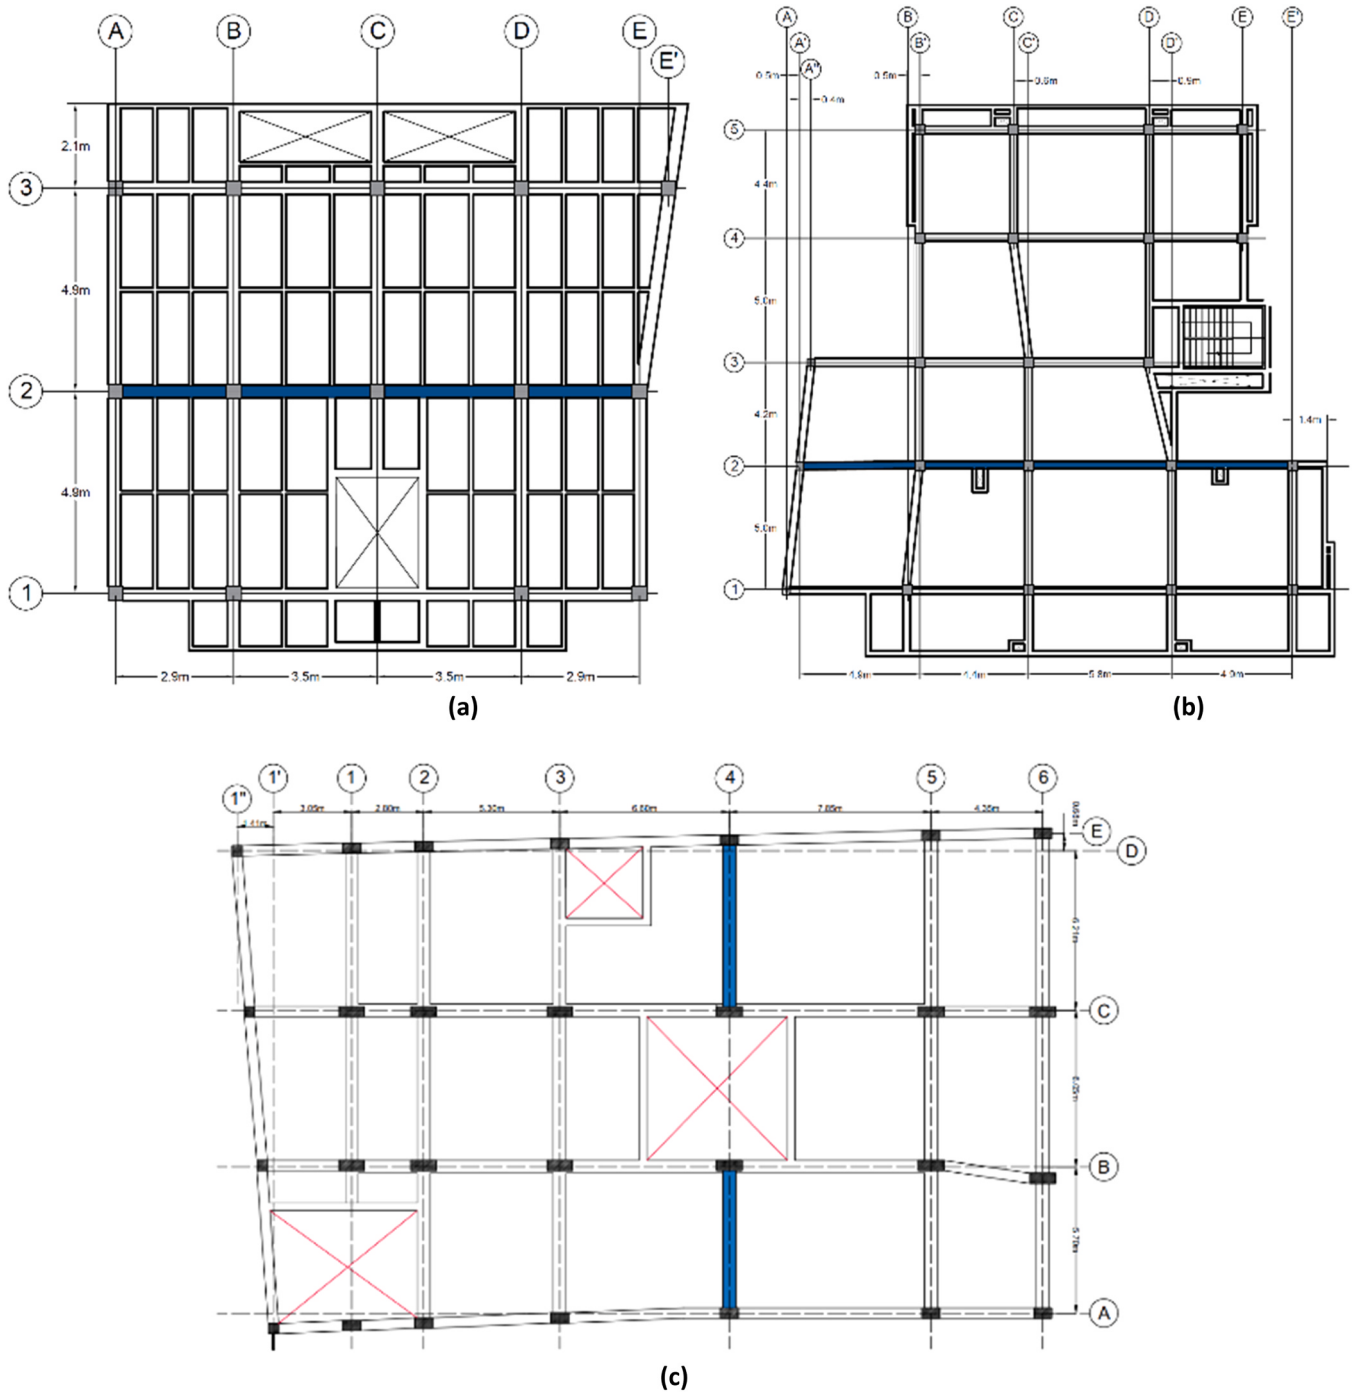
Plan layout of the buildings: (a) 3 F, (b) 4 F, (c) 14 F.
